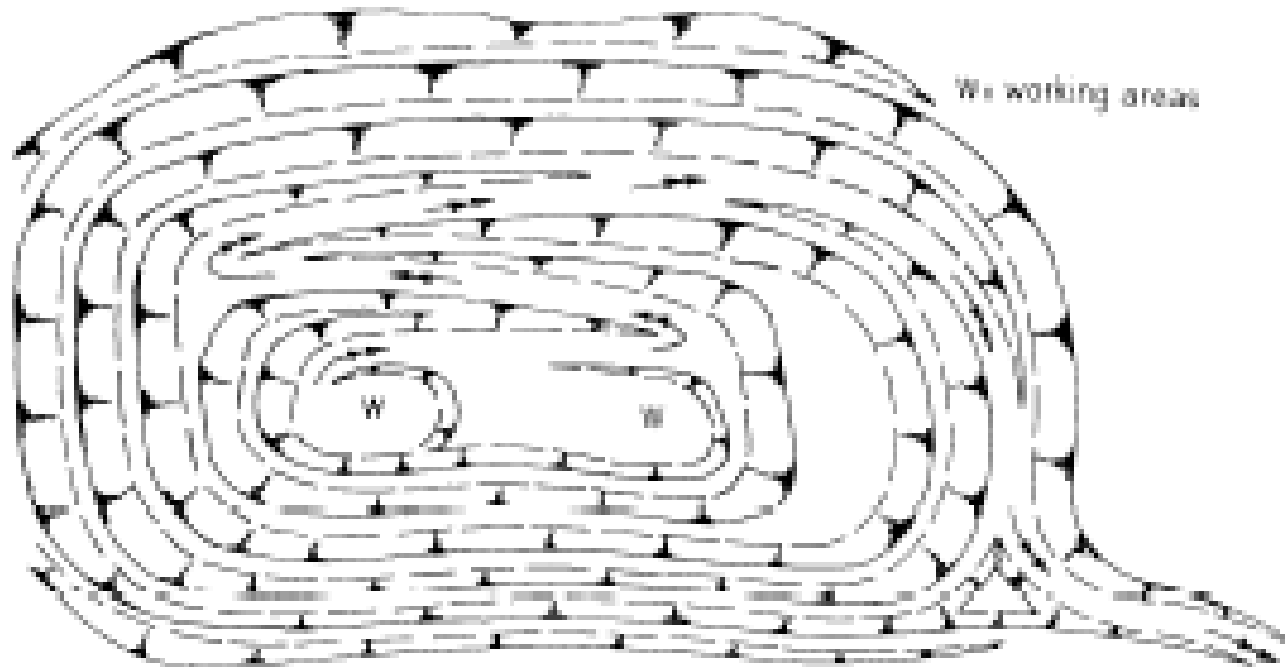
Diagrammatic open pit layout with switchback haul road. W = working areas
